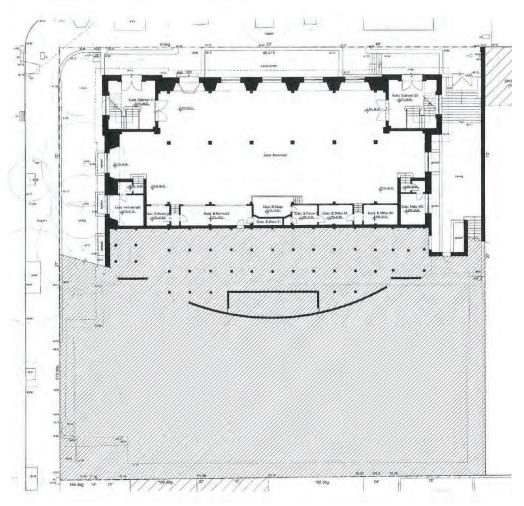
Lower Ground Floor Plan (Source: Cornerstone)
